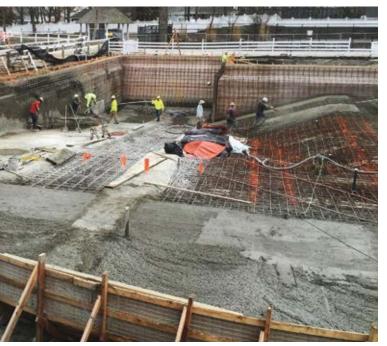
Shotcrete installation -4 ft (1.2 m) wide strips being installed and the 10 ft (3 m) wide openings to be filled in later
